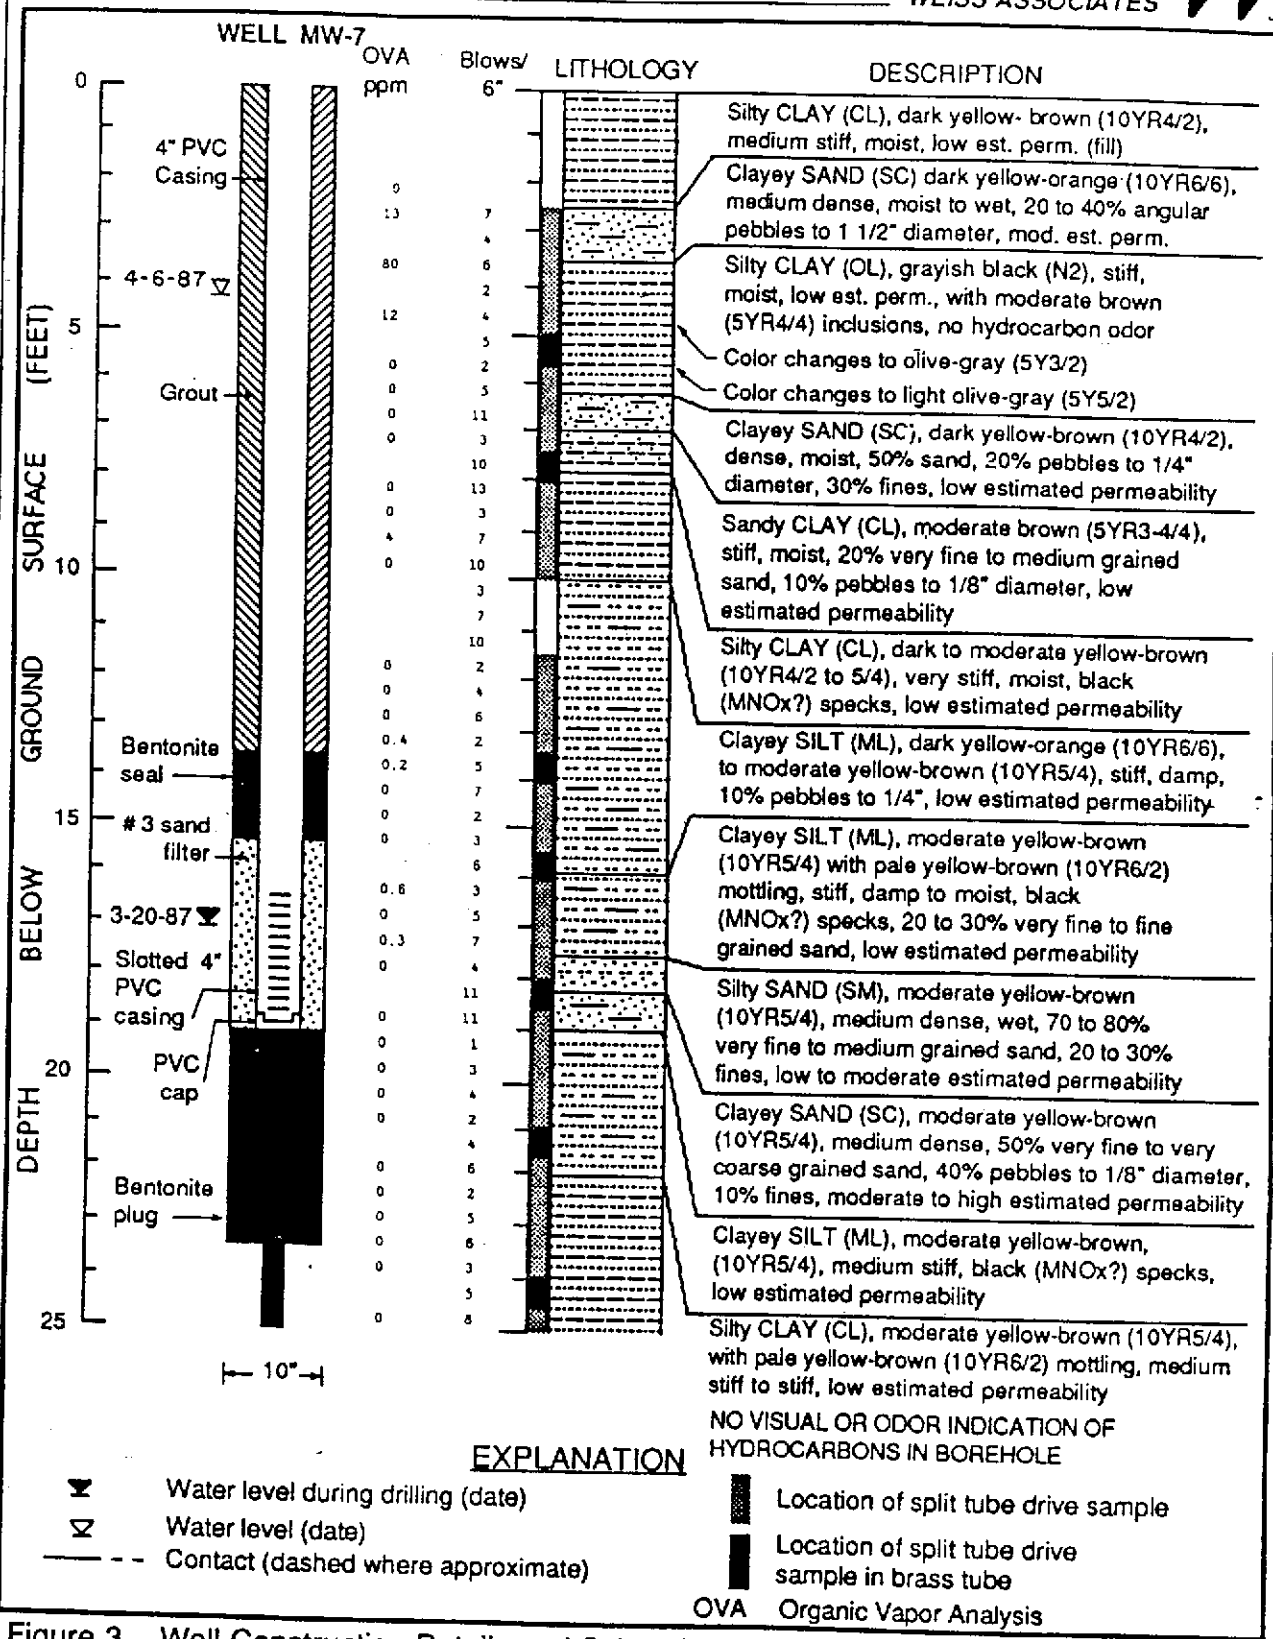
Well Construction Details and Subsurface Lithology - Well MW-7
